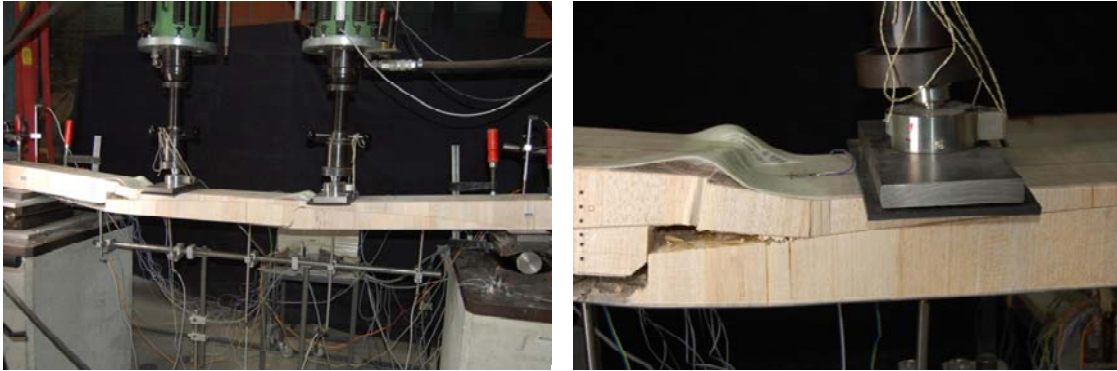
Failure of beam B-H/L-1 (left), zoom of detailed failure mode (right)
